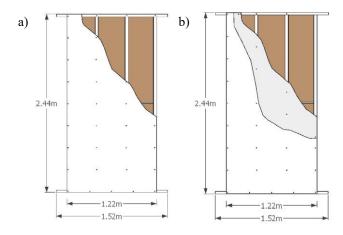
Gypsum-sheathed bearing walls: a) one layer of gypsum on both sides, and b) two layers of gypsum on both sides
